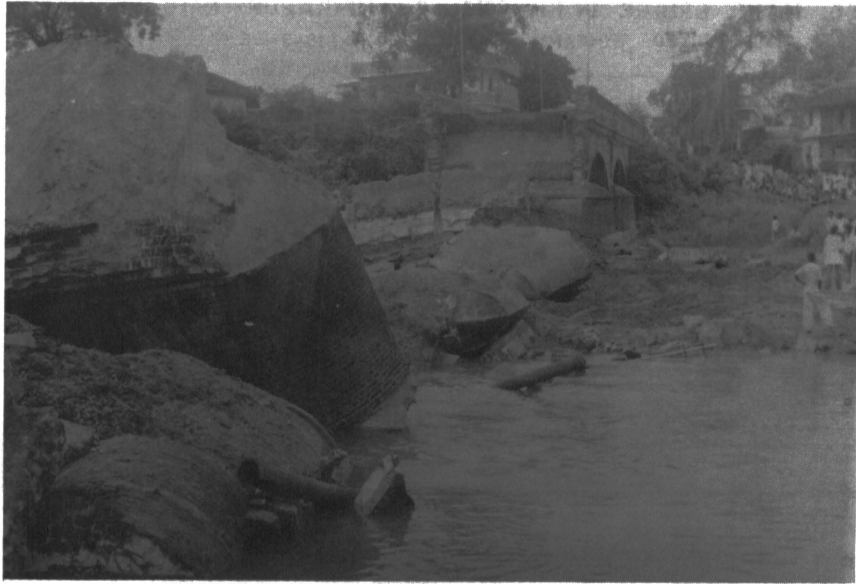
Pier No.3 from Piparia side of Palakmati Bridge.
